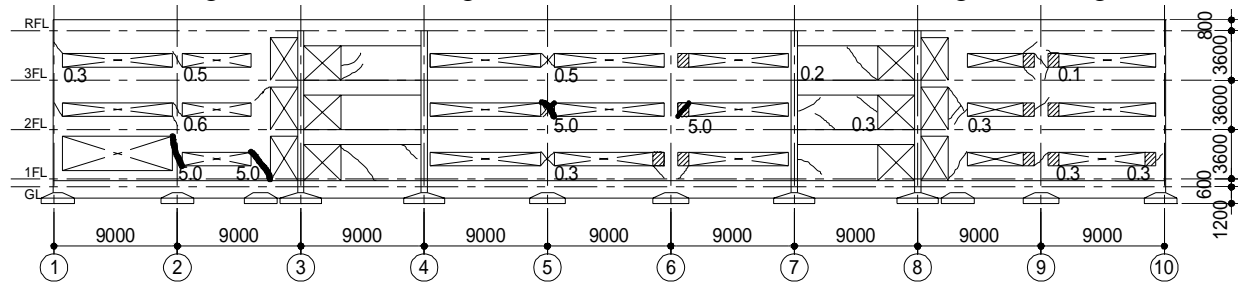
Crack pattern of C frame (TS-1 building of TS-High school)
